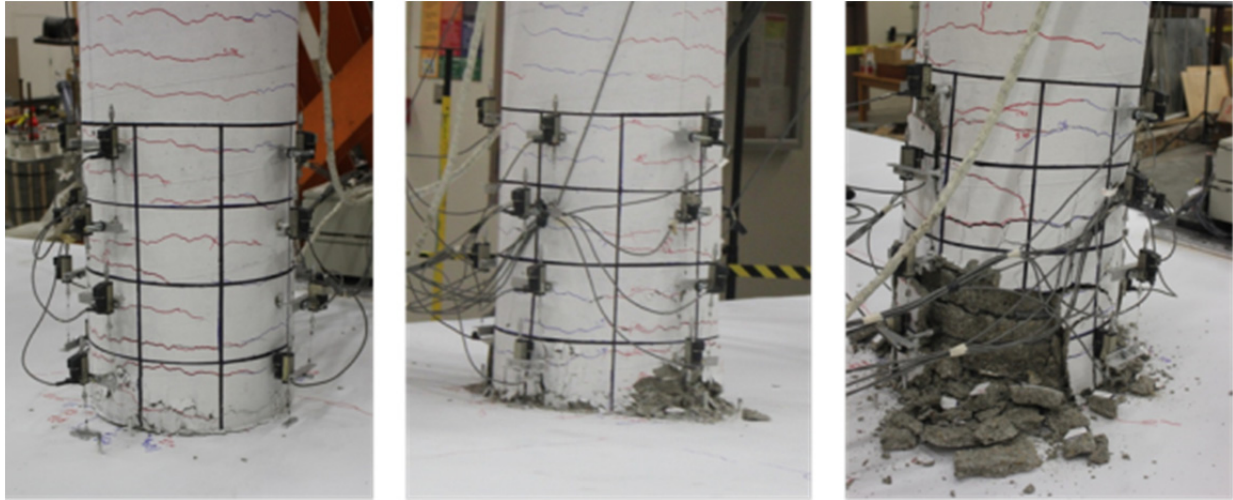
Propagation of the column cracking and spalling in the plastic hinge zone.
